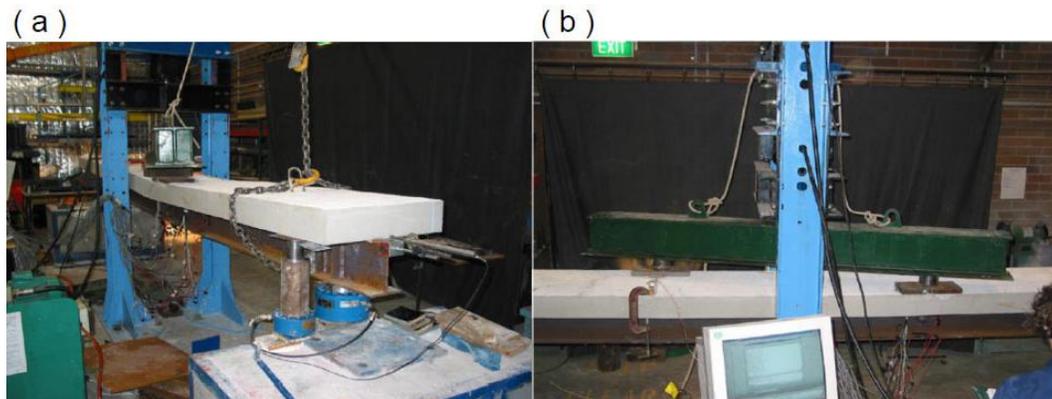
Experimental programme (a) Full scale specimen of steel concrete composite beam (b) Loading setup; Source: Tan et al. (2009)
